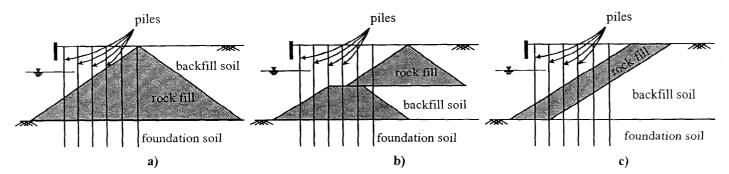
Typical pile supported wharf geometries: a) single-lift rock dike. b) multi-lift rock dike, and c) sliver rock dike. Fig. 1. Typical pile-supported wharf geometries; a) single-lift rock dike, b) multi-lift rock dike, and c) sliver rock dike.
